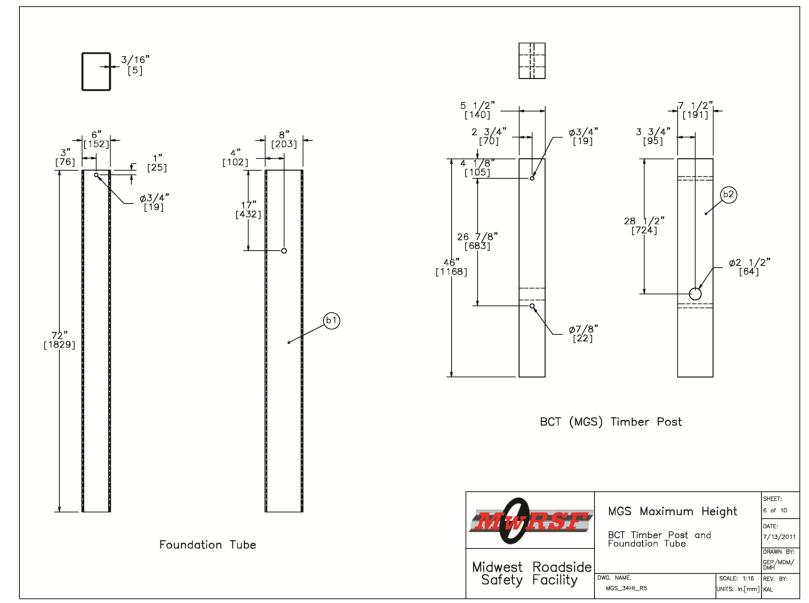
Anchor Post Details, Test No. MGSMRH-1
